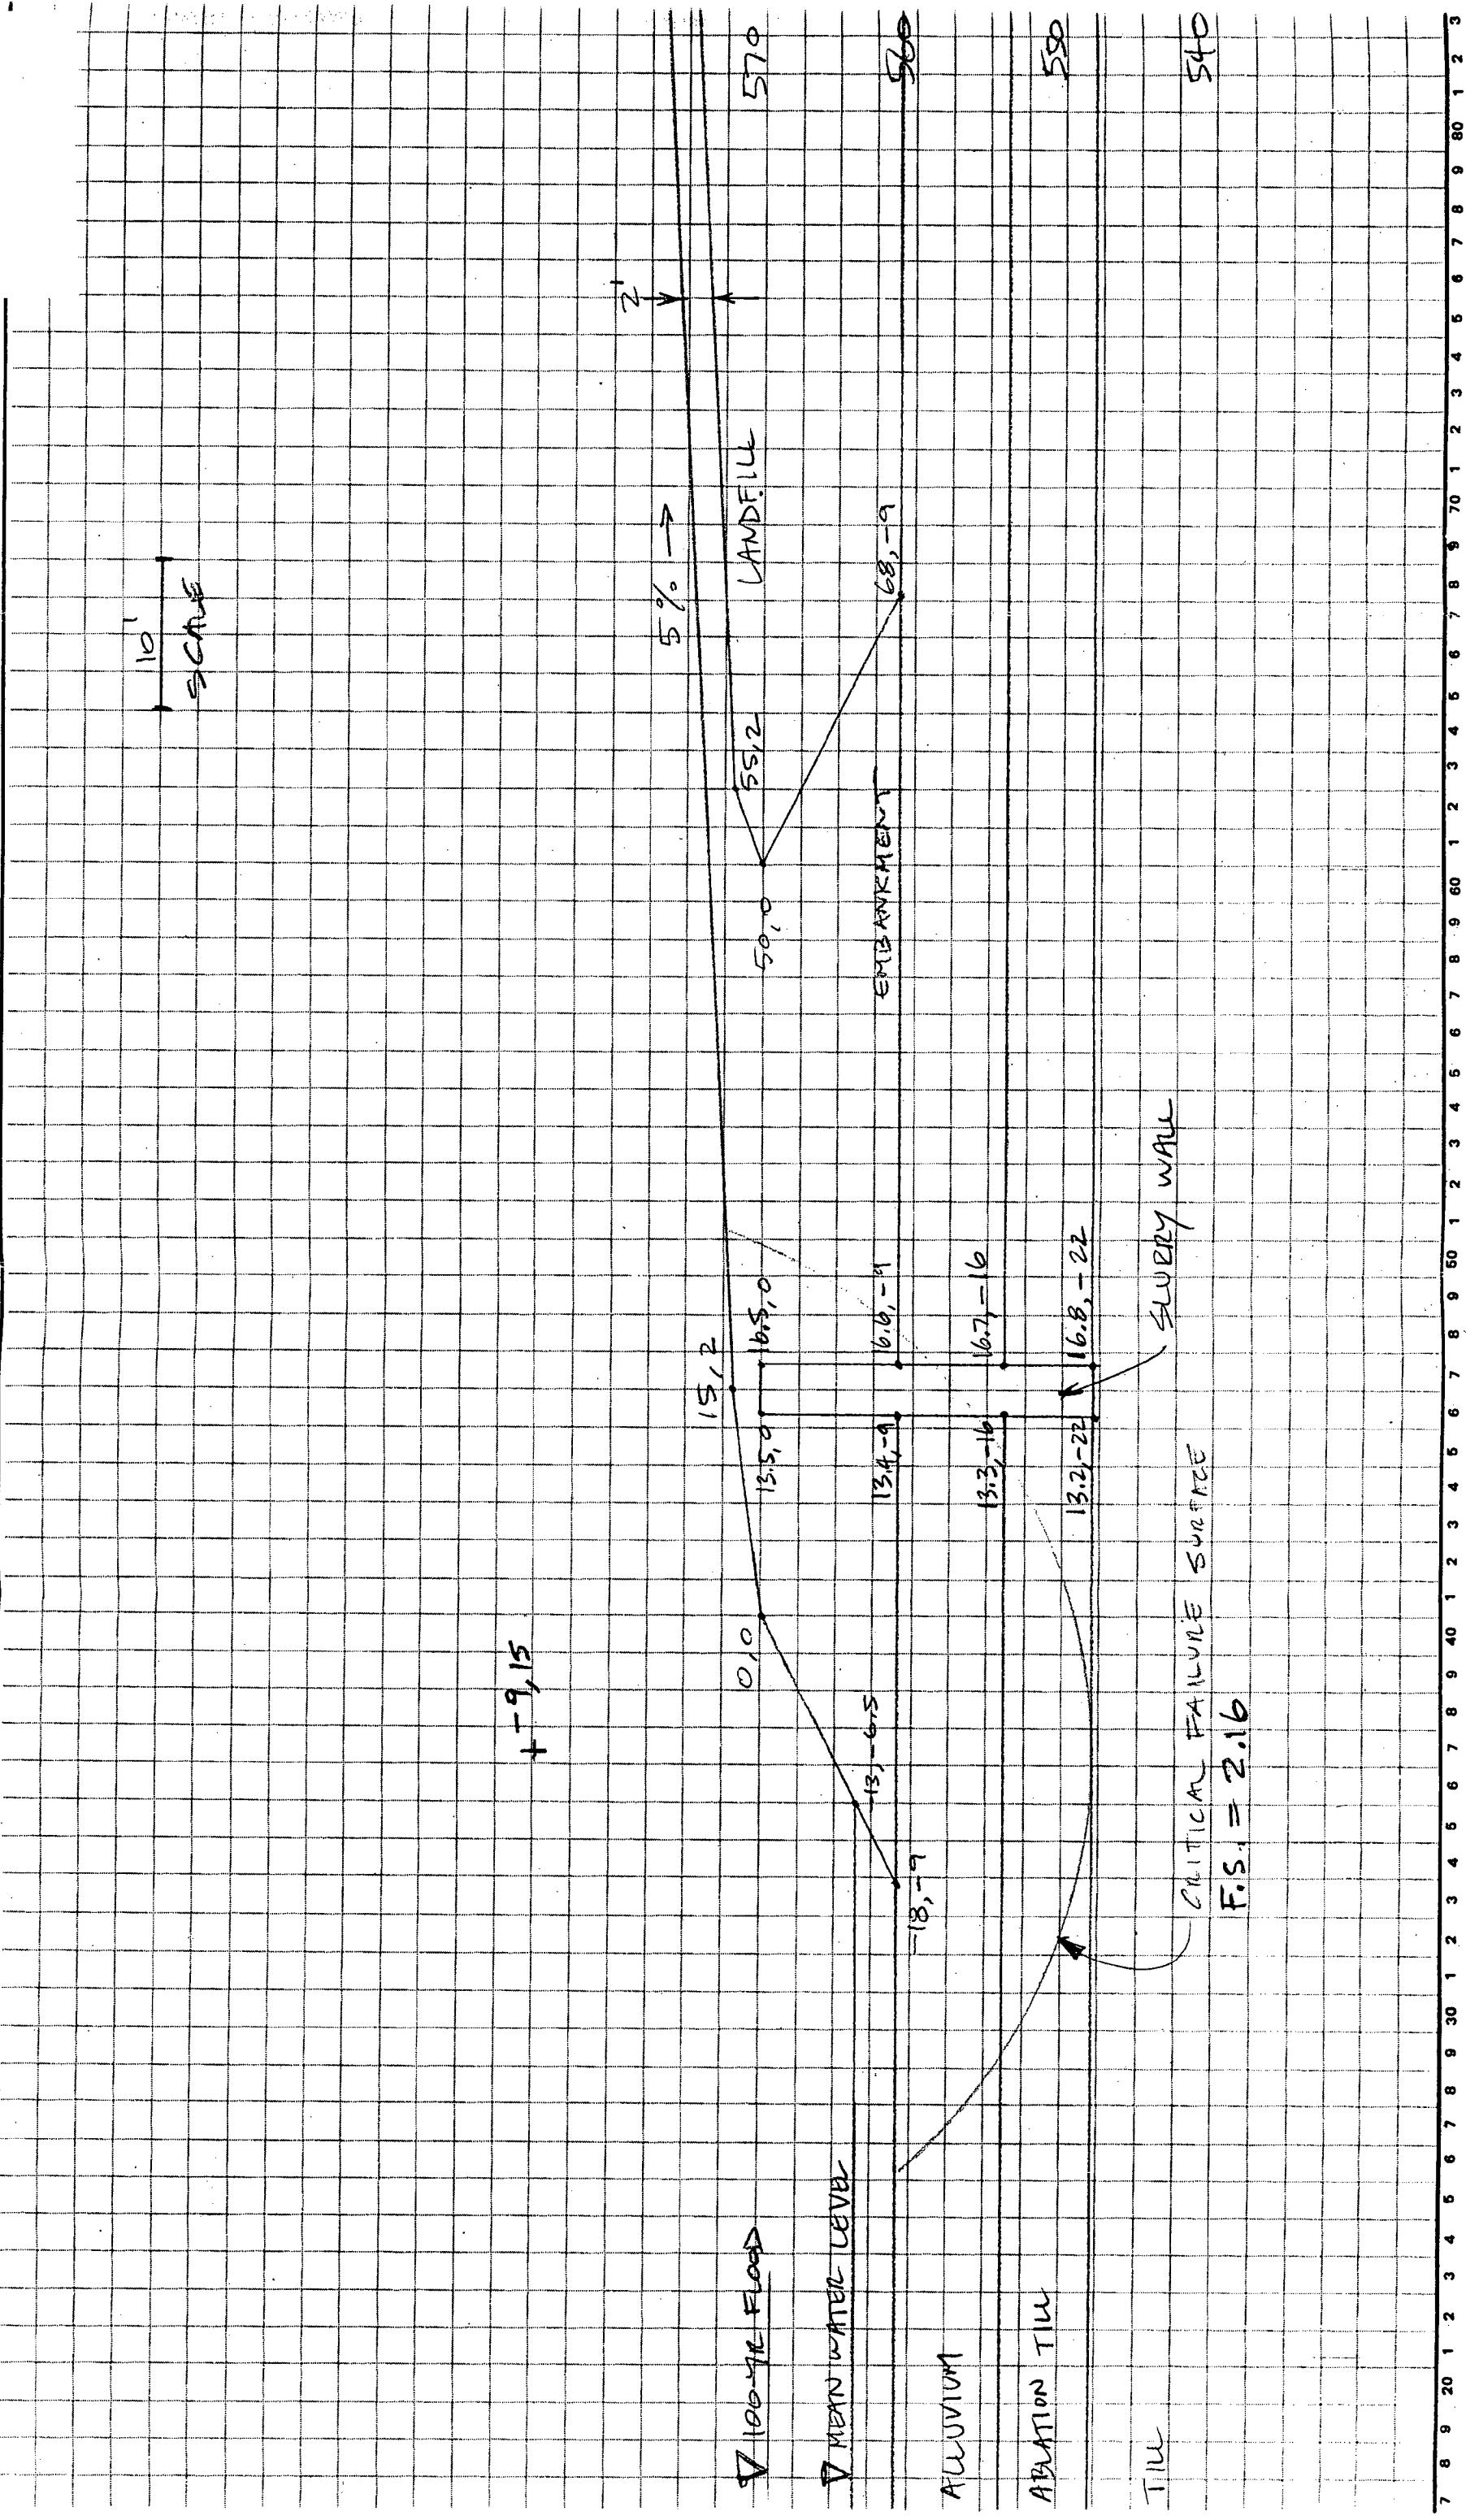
BULLETHORN, WEST END OF OXYCITEN PROPERTY, cross-section NO. 3
